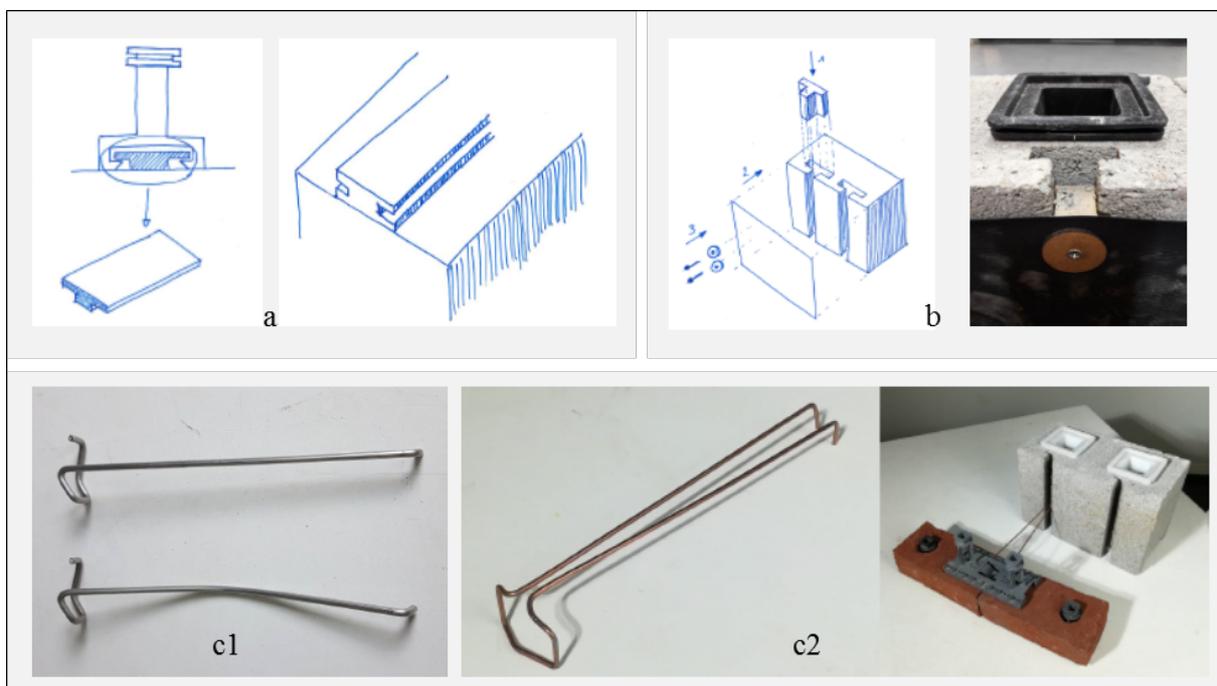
Three suggested improvements for systems 1 & 2 – composition A: a) a mounting lath for a circular connection with the foundation; b) a connecting block to fix the watertight slab between foundation and inner wall; c) with c1 the existing cavity anchor, and c2 an alternative cavity anchor.
